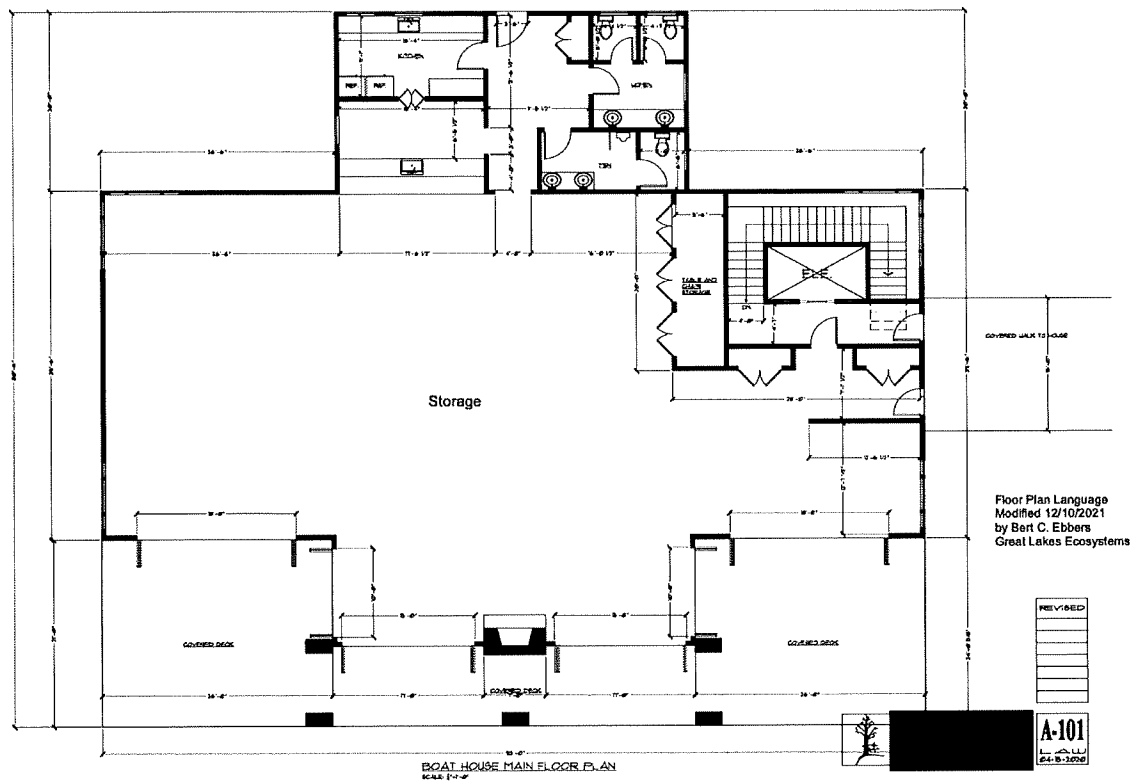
Only one word changed on “revised” plan: “Storage” instead of “Event Area” (From Exhibit T, Bates # 223).
